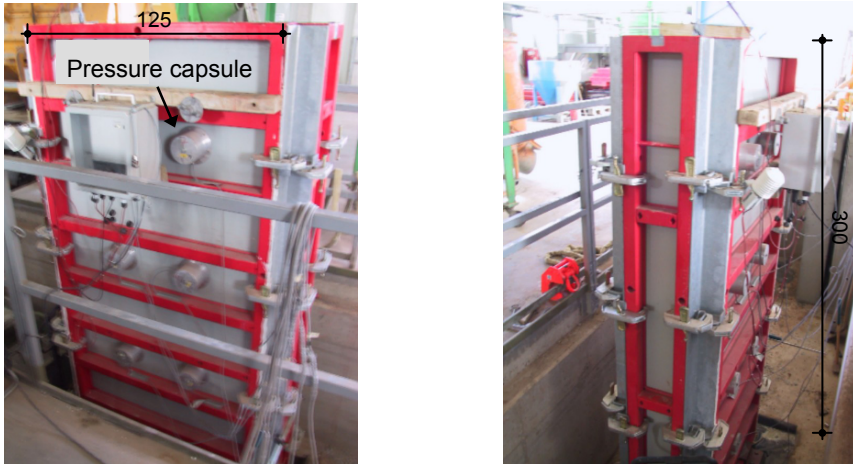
Panel wall formwork system for the field tests – front view (left) and side view (right); all dimensions in [cm].
